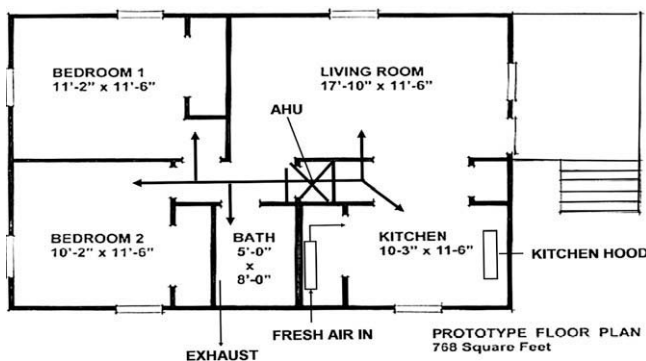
Floor plan of Tuskegee Healthy House (THH).
